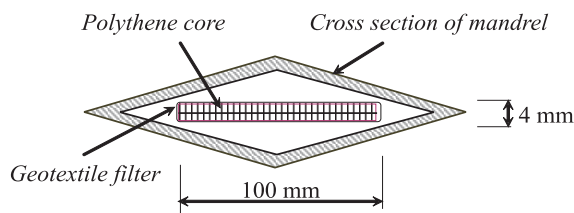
Schematic cross section of prefabricated band-shaped drain with mandrel
